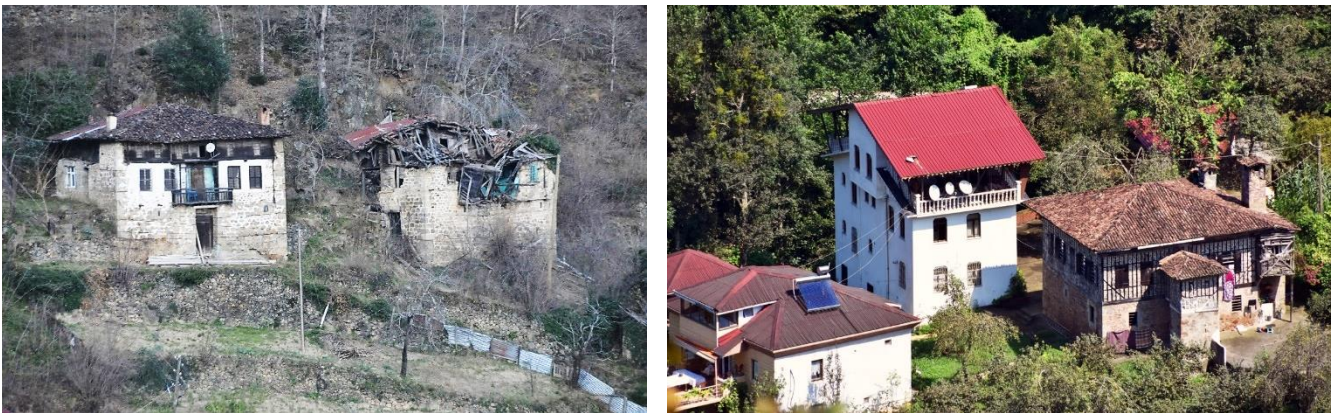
Abandoned and decaying vernacular houses in Kondu (left; 2015); new houses constructed close to a vernacular house in Üstündal (right; 2016).
